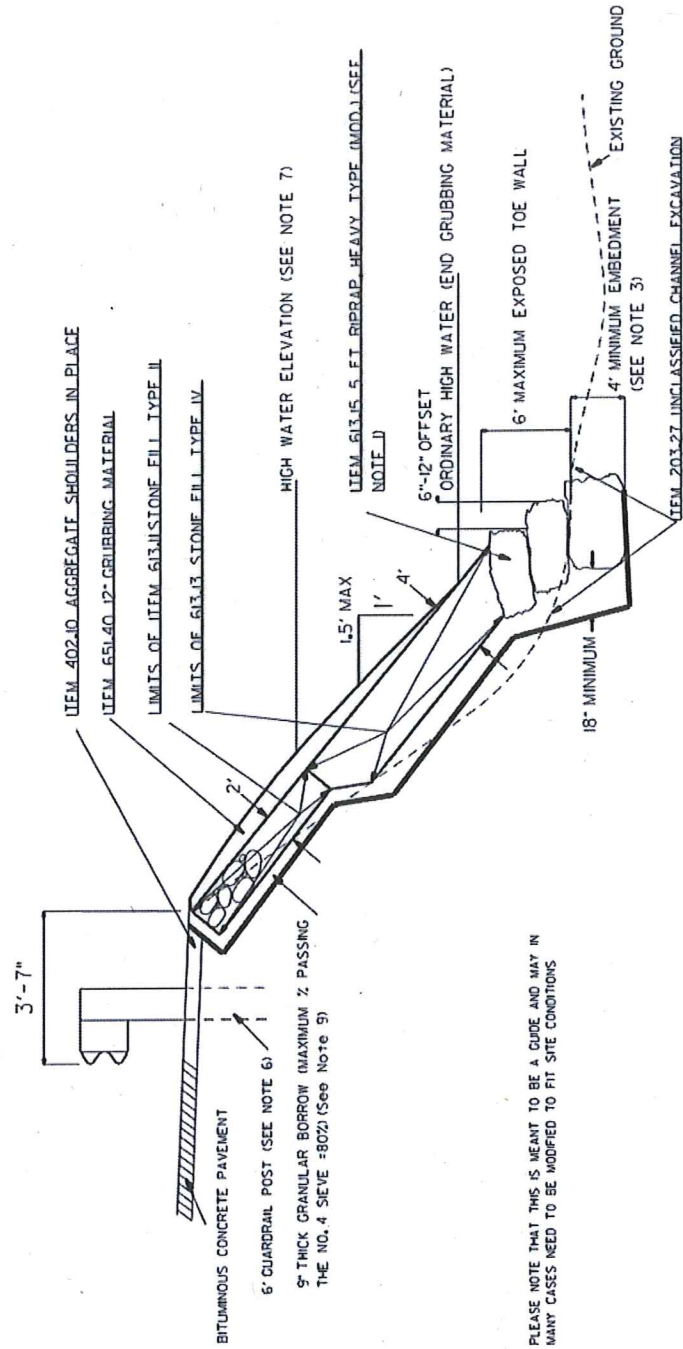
A placed Rip Rap Wall creates lateral channel stability. The steep slope at toe results in less horizontal fill which allows for attainment of full bankfull channel width in confined settings.
